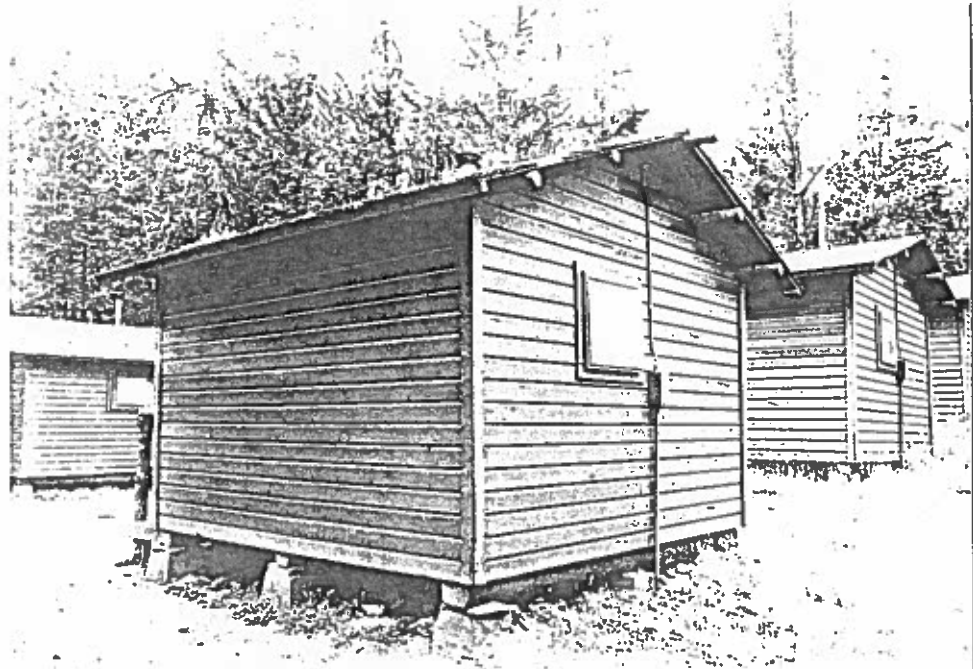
Looking south at cabin 61 which is generally in good condition. There are a few cracks in the drop-lap siding and the corner boards have come apart. Note the electrical conduit on the rear of the cabin.
